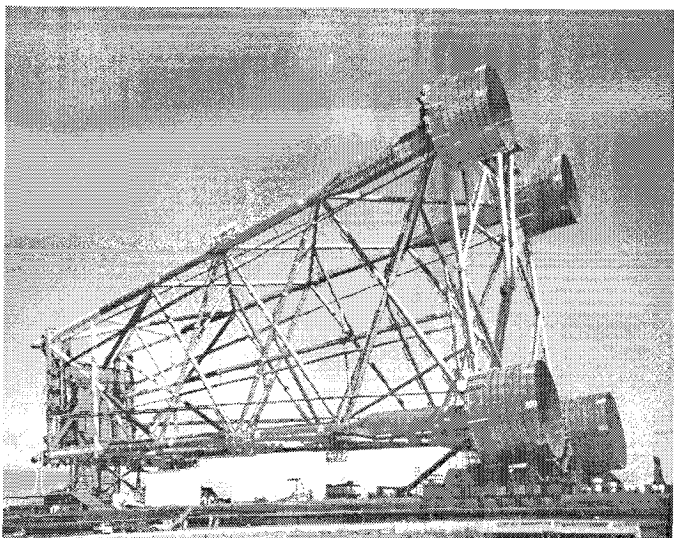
The North Sea Draupner jacket with skirted foundations (Photo by Statoil).
